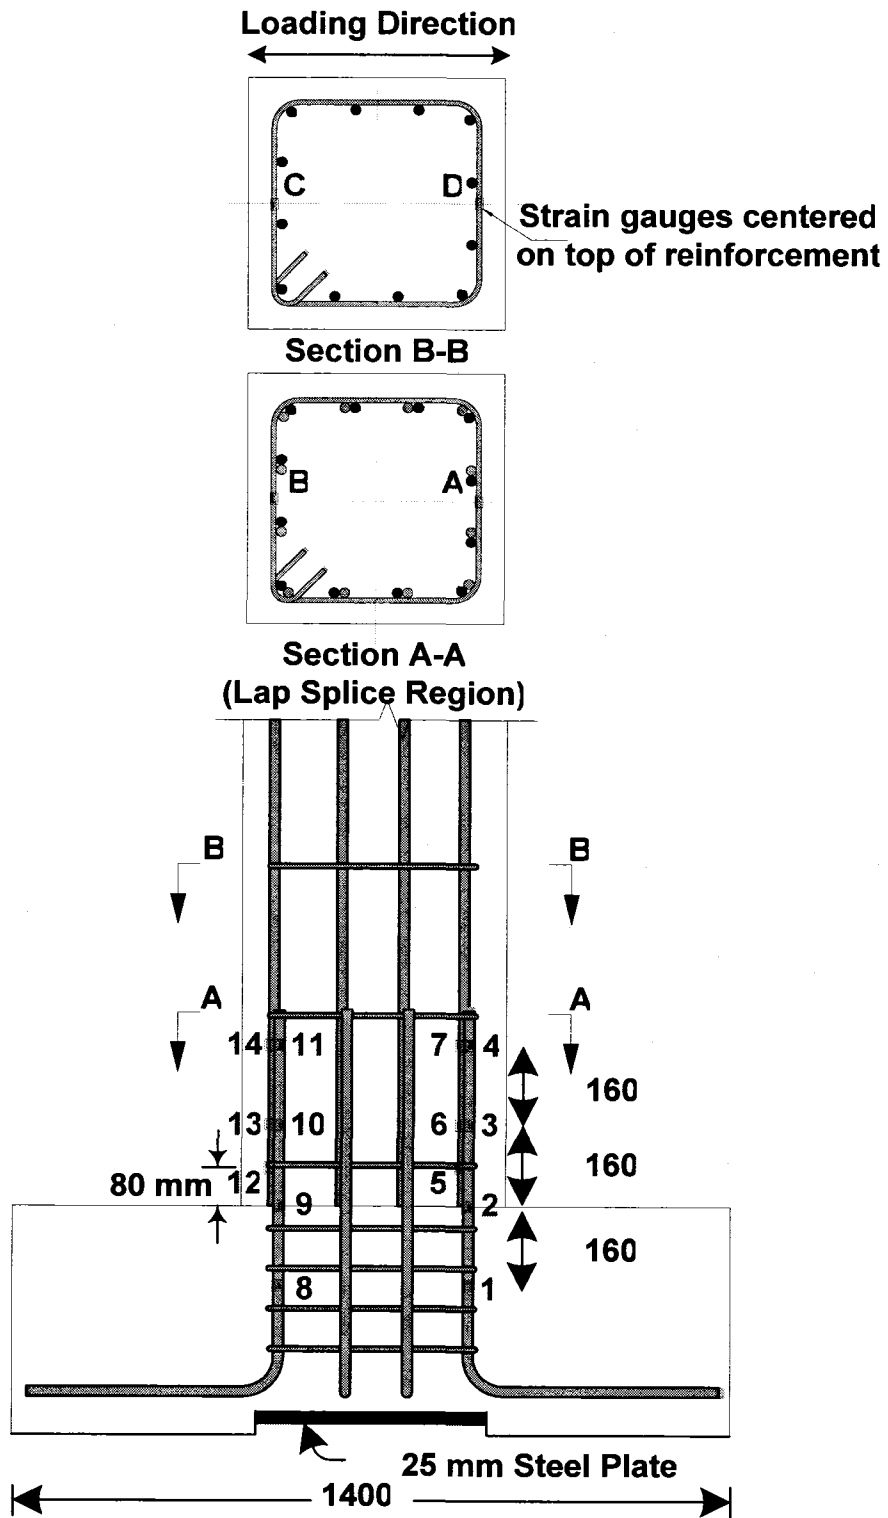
Strain gauge location on reinforcing steel for Columns SSR-C and SSR-R
